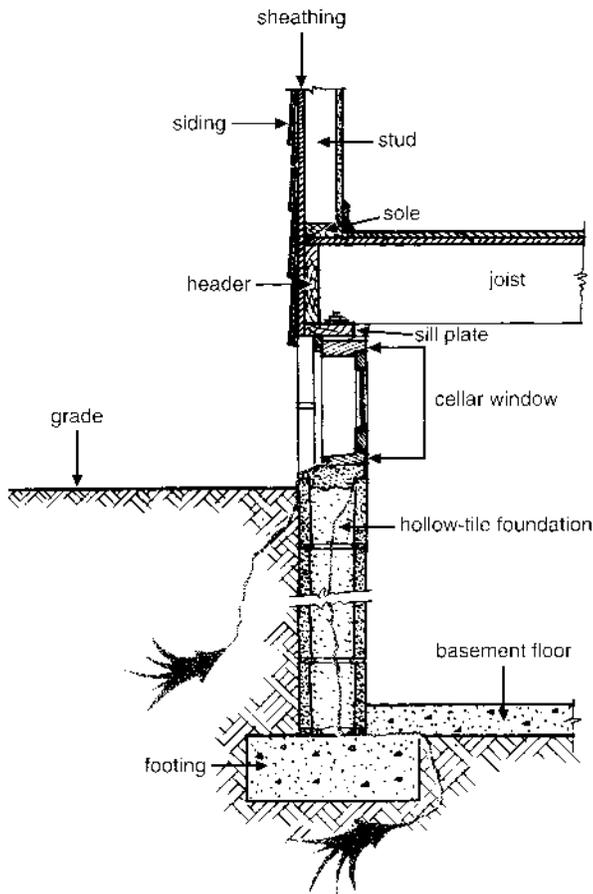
An example of a concrete block foundation with basement window. Avenues of termite access are indicated by the heavy arrows in the soil (NPMA).
